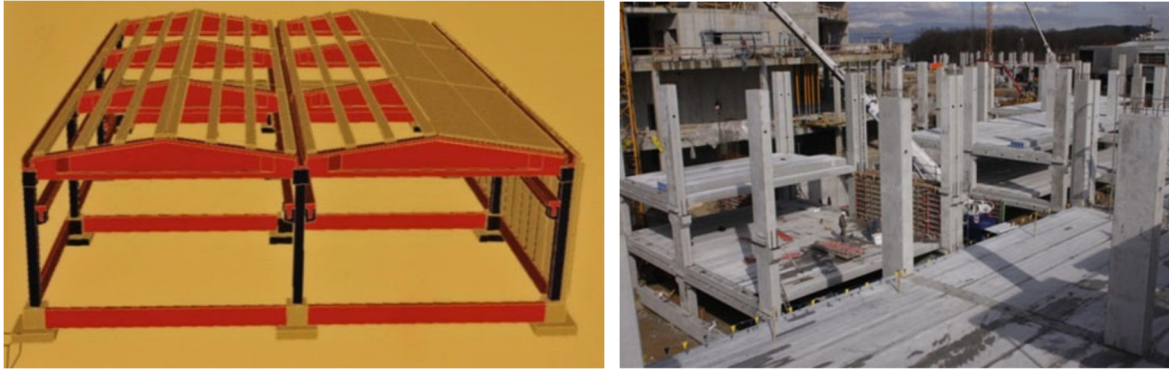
Structural system consists of assemblage of cantilever columns tied together with beams and floor structures (M. Fischinger et al., 2014)
